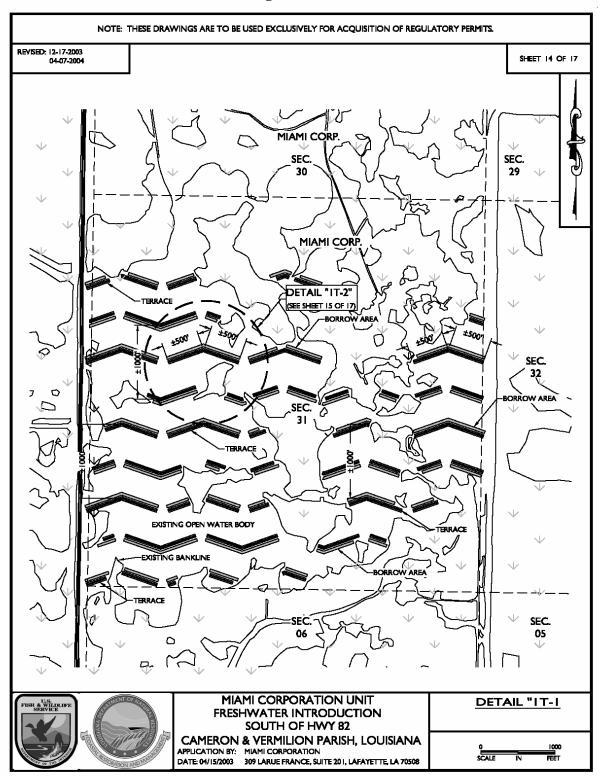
Freshwater Introduction South of LA Highway 82 Project Duck-Wing Terrace Plan and Cross Sectional Views
